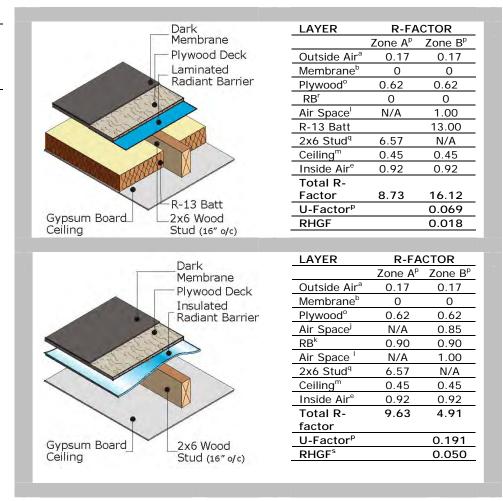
(cont'd.) Low-slope plywood deck roof assembly
